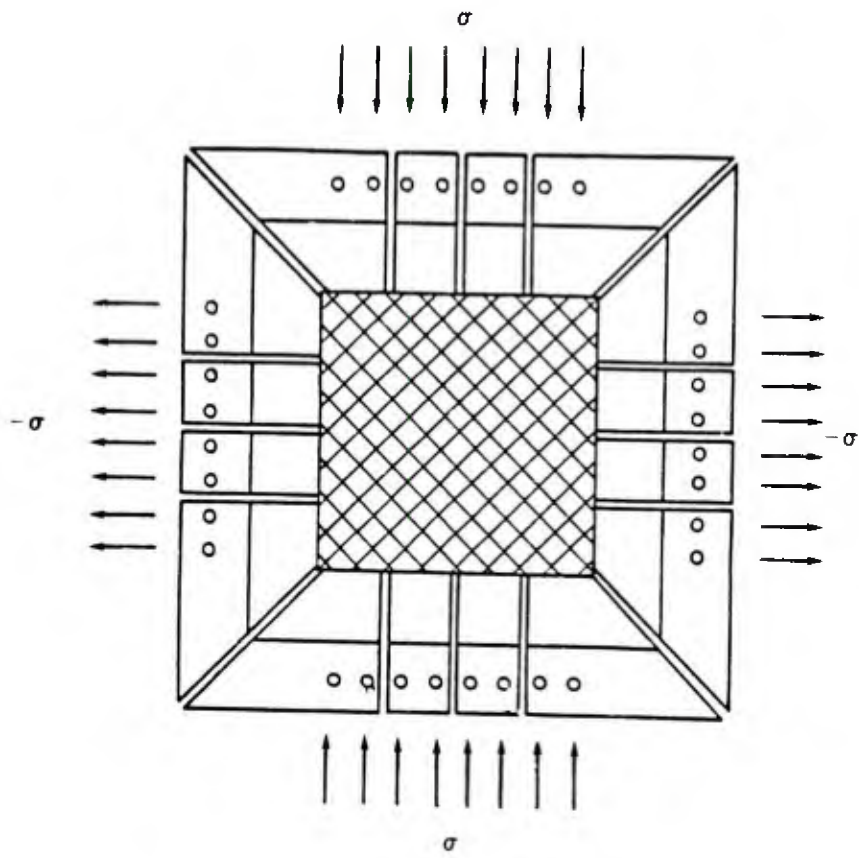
JAPANESE SPECIMEN AND LOADING SCHEME (8)
